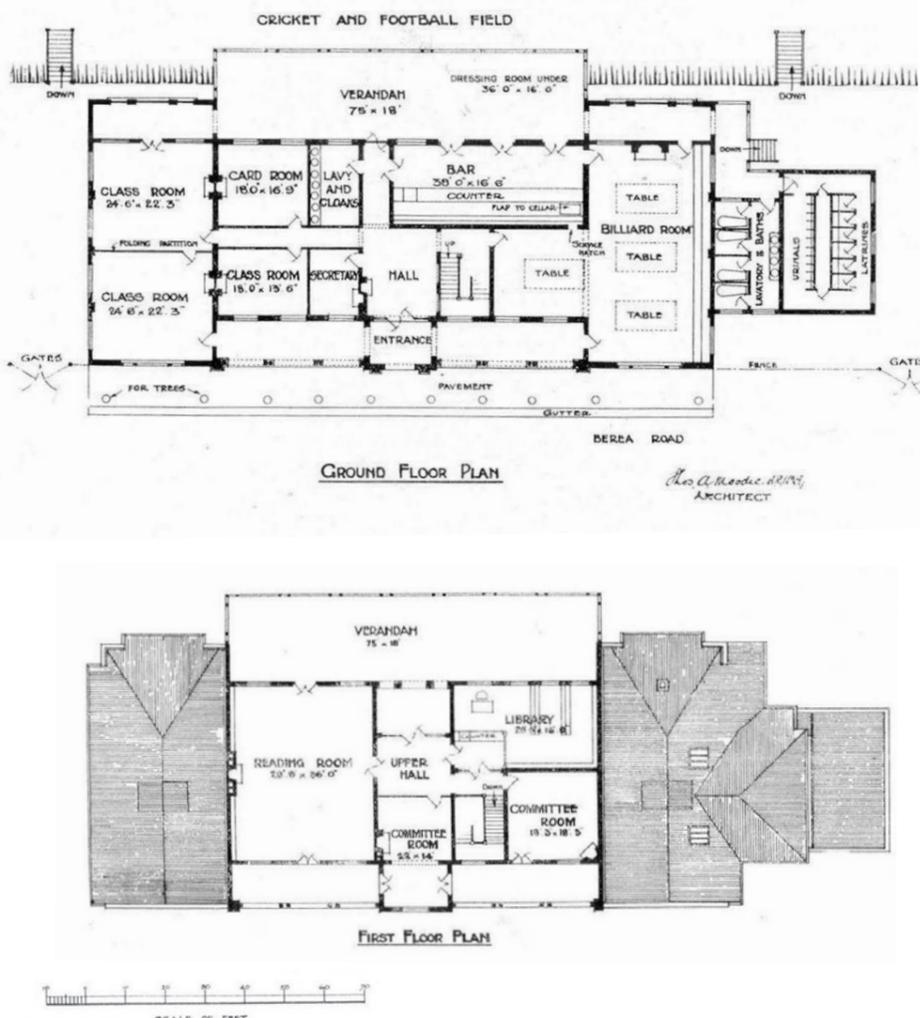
First and ground floor plan from the South African Railway Magazine, 1907 (Bruwer & Paine 2009)
